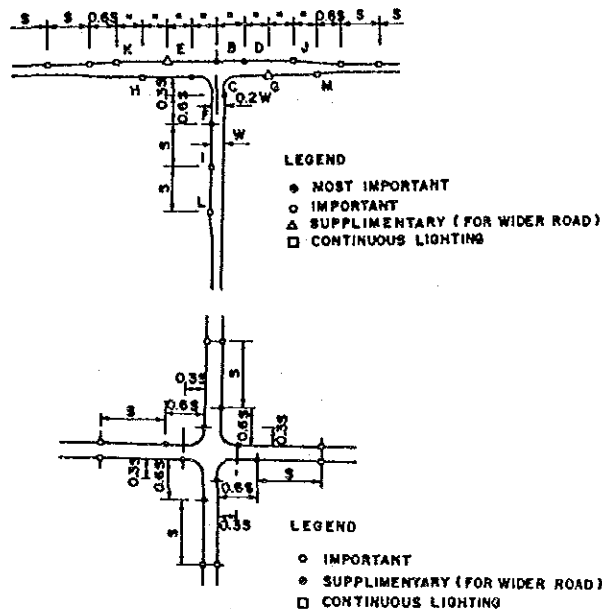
Typical Luminaire Arrangement (Intersections)
